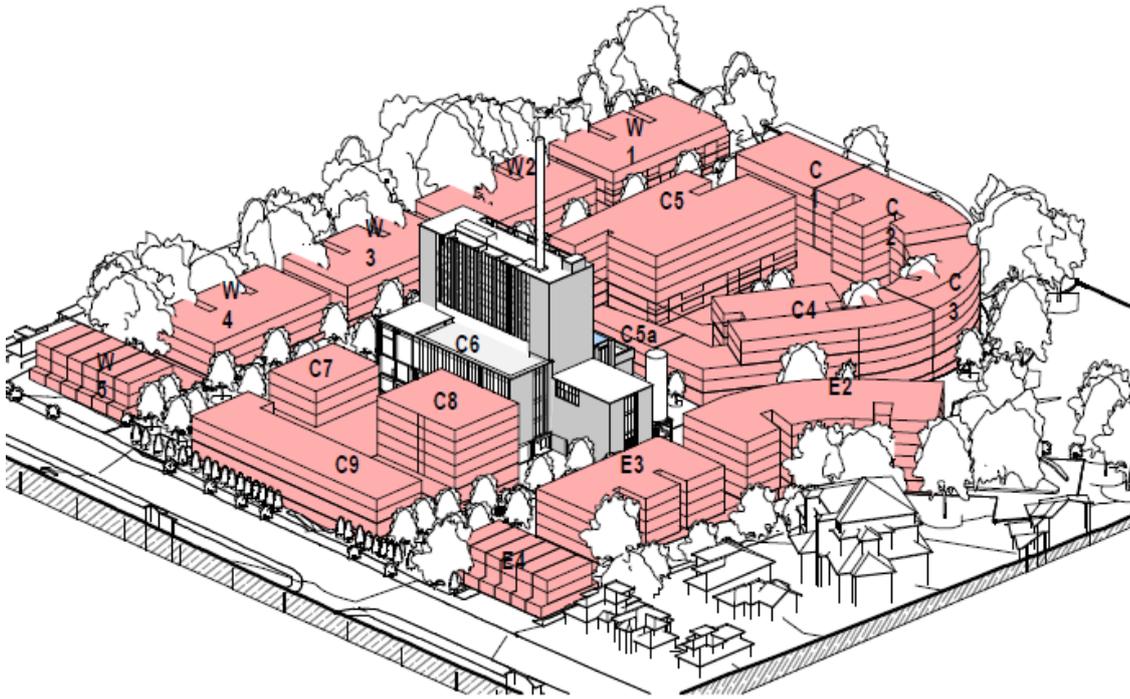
Proposed built form, south-east view from Burwood Road (Source: BVN Concept plan)
